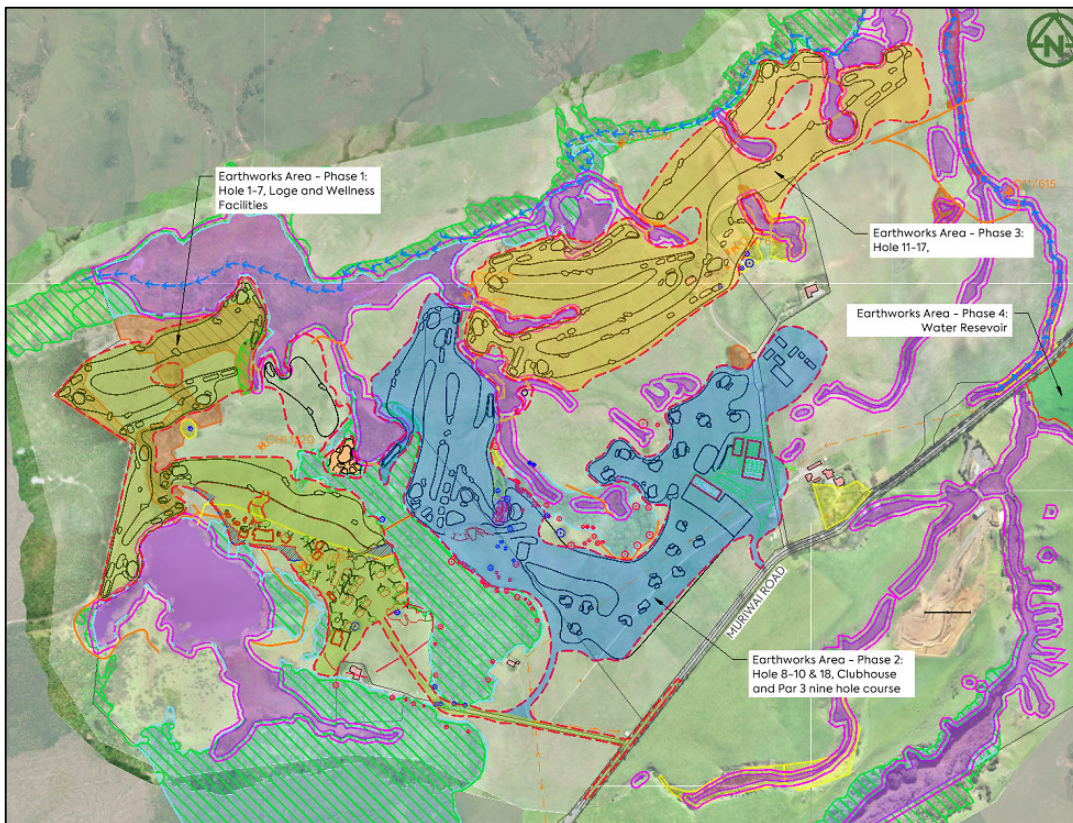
Site Layout with Preliminary Earthworks Staging concept
